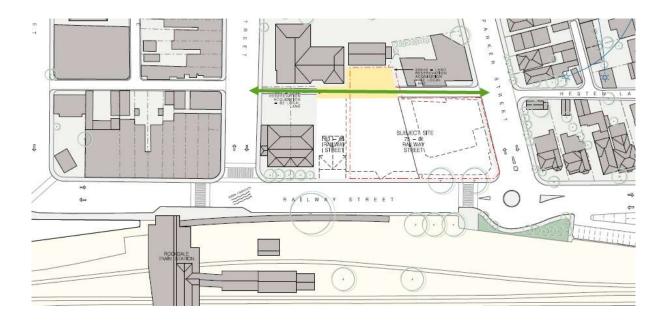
Through Site Link Proposed Across the Rear of the Subject Site and Adjoining Land
